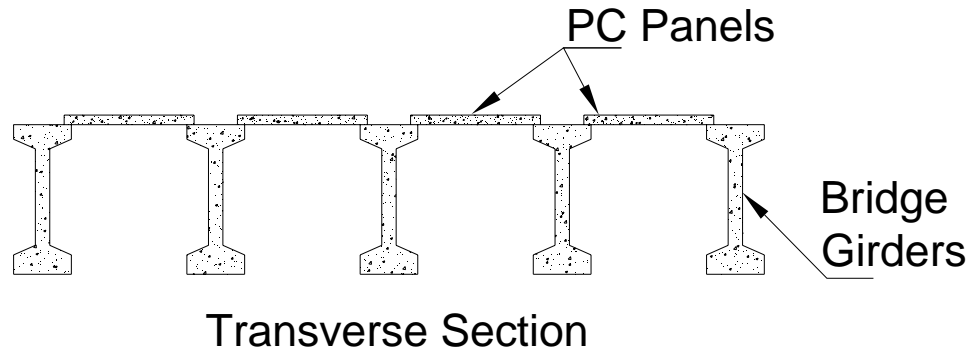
Typical Placement of PC Panels on Edge of PC Girders
